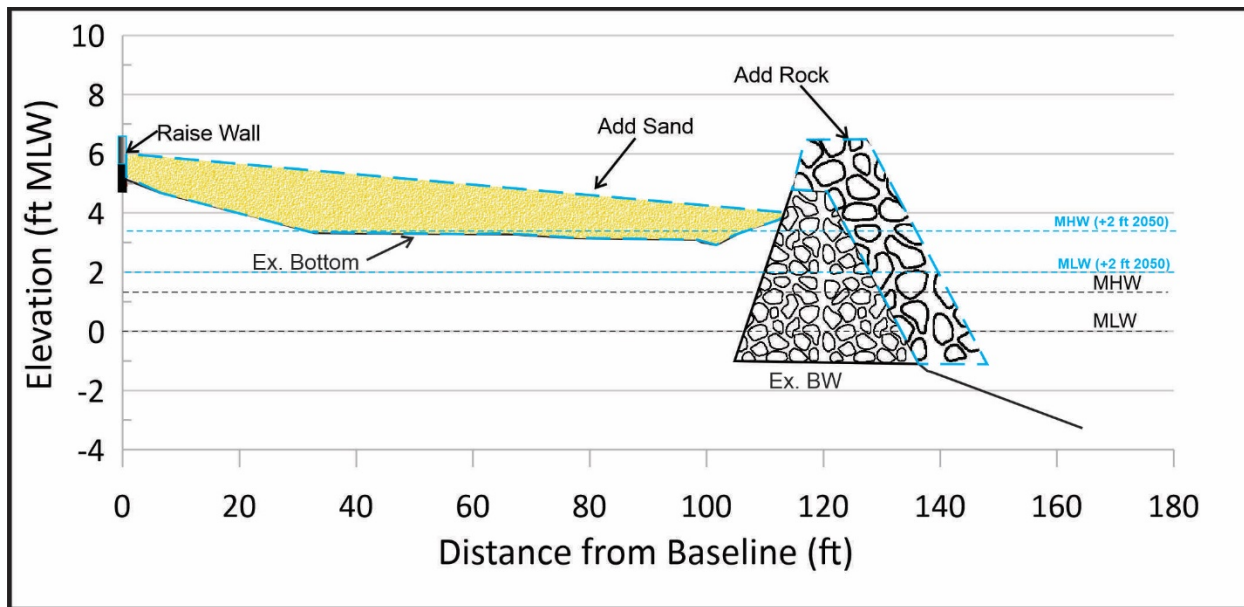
A typical cross-section of existing conditions at a low bank breakwater site (Aquia Landing). The system is backed by a low wall that could be raised to contain the added sand to adapt the system to 2050 projected sea levels (blue). Rock could be added to the breakwater structures. After Hardaway et al. (2019).
